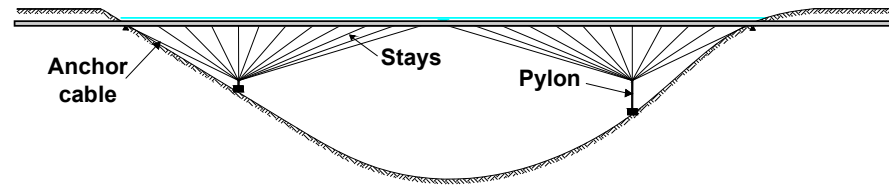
Longitudinal view of the Immersed Inversed Fan Cable-Stayed Bridge.
